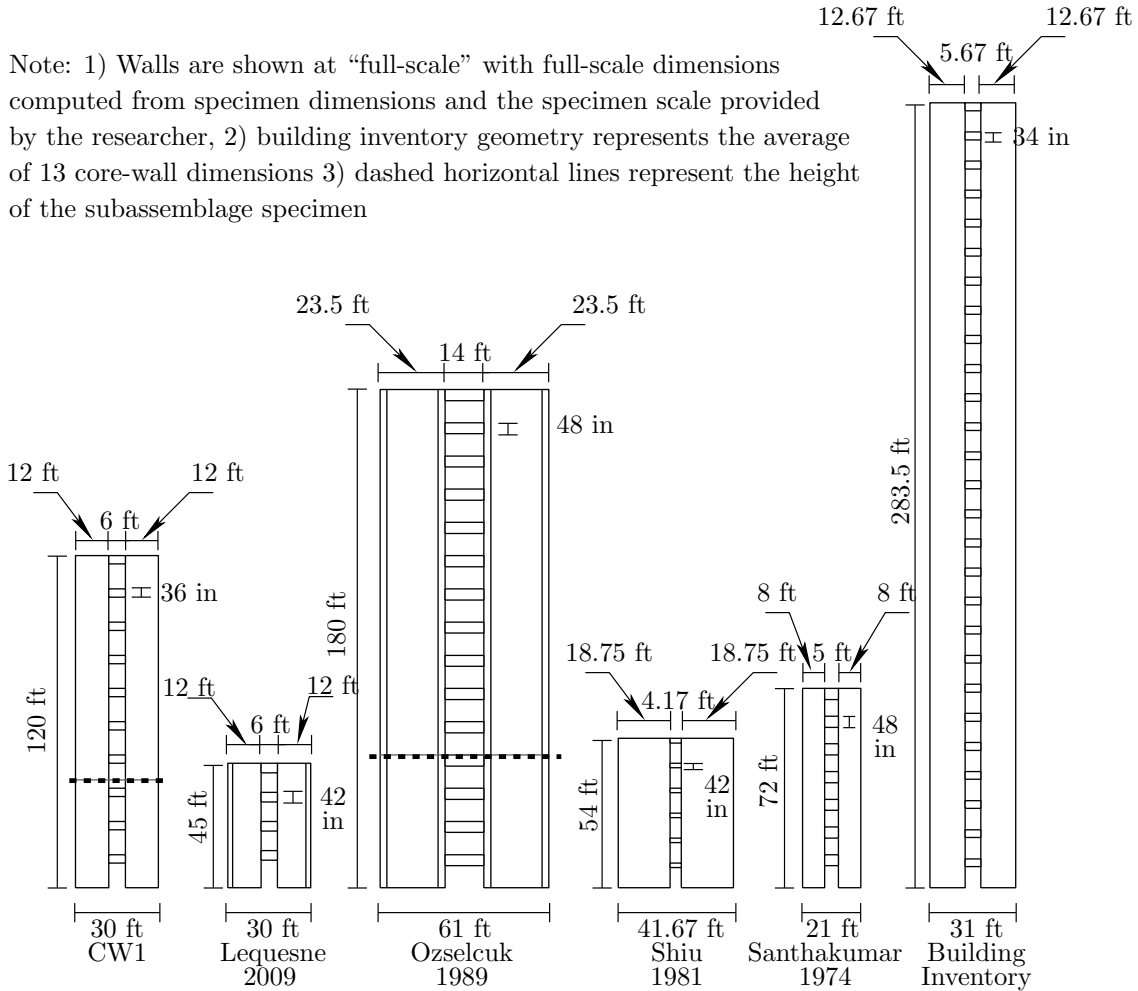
Comparison of coupled wall specimens and building inventory geometry
